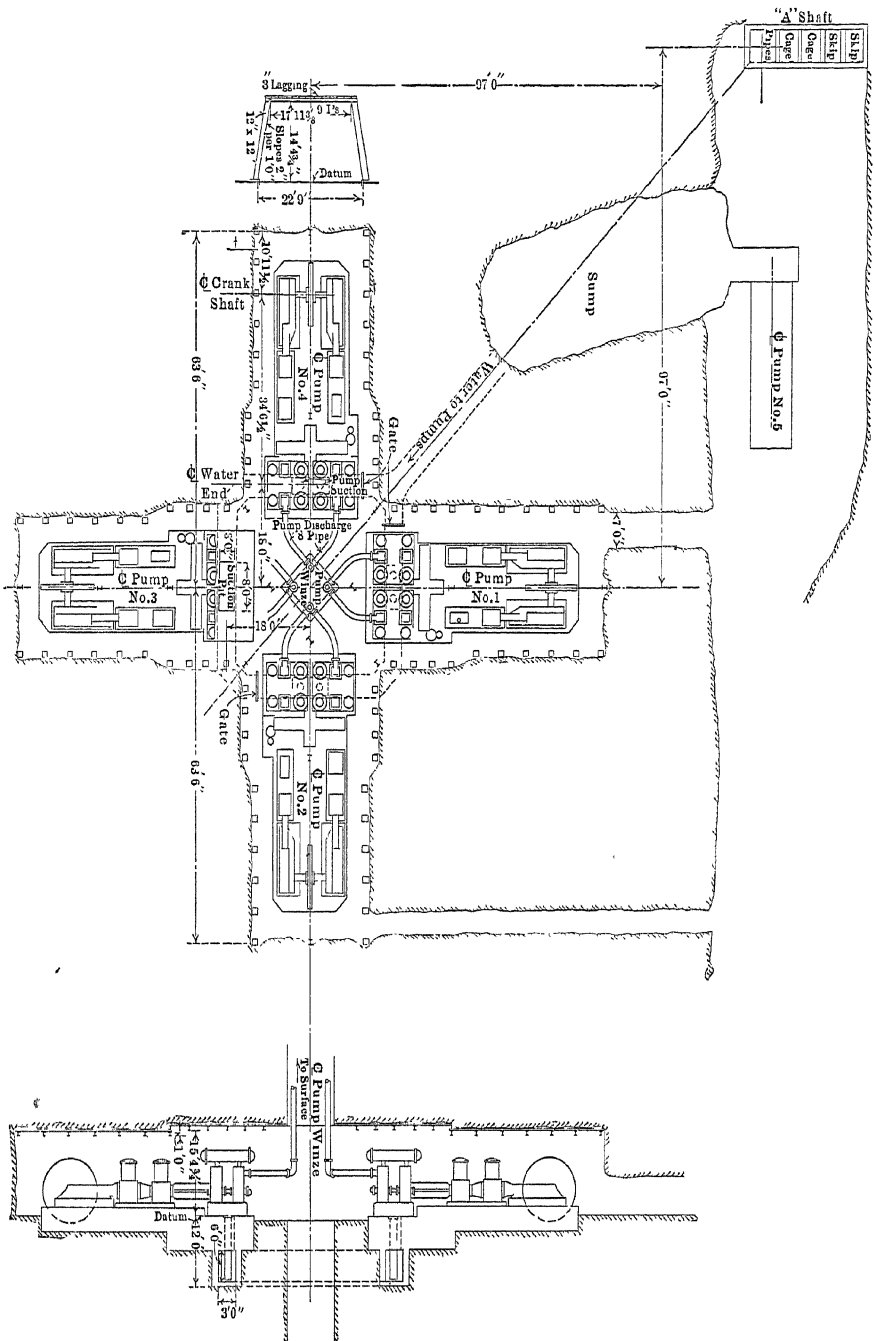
ARRANGEMENT OF PUMP STATION ON 12TH LEVEL.
